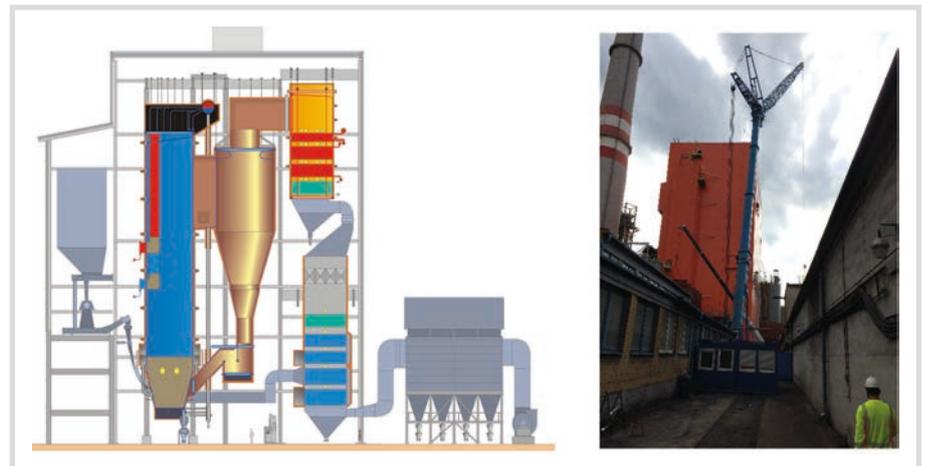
Arcelor Mittal Ostrava new CFB boiler replacing four old PC boilers.
